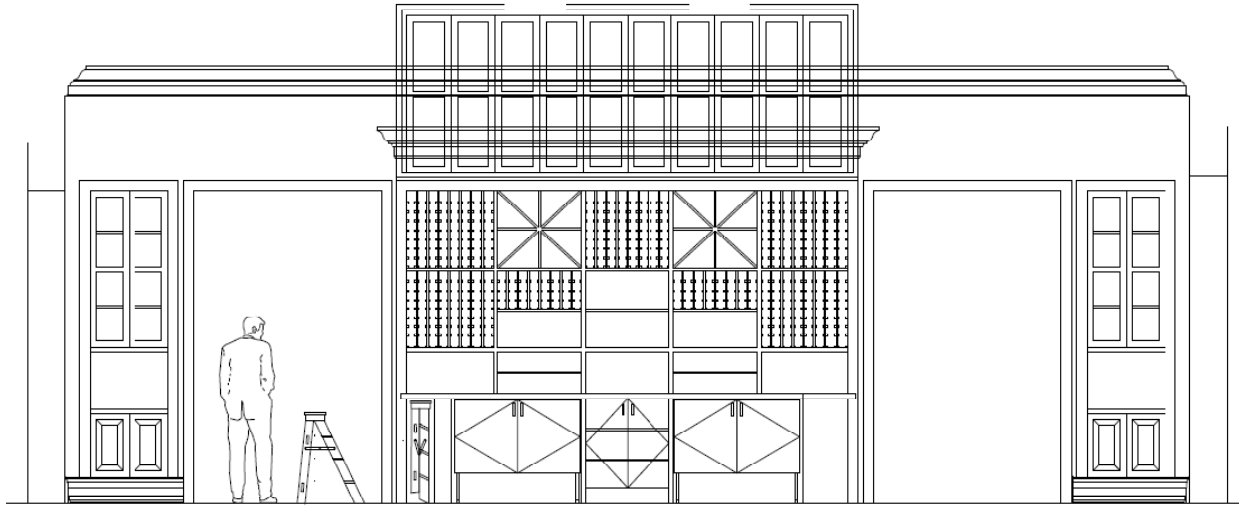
Wine Bar east elevation – wood paneling recessed in ceiling.
